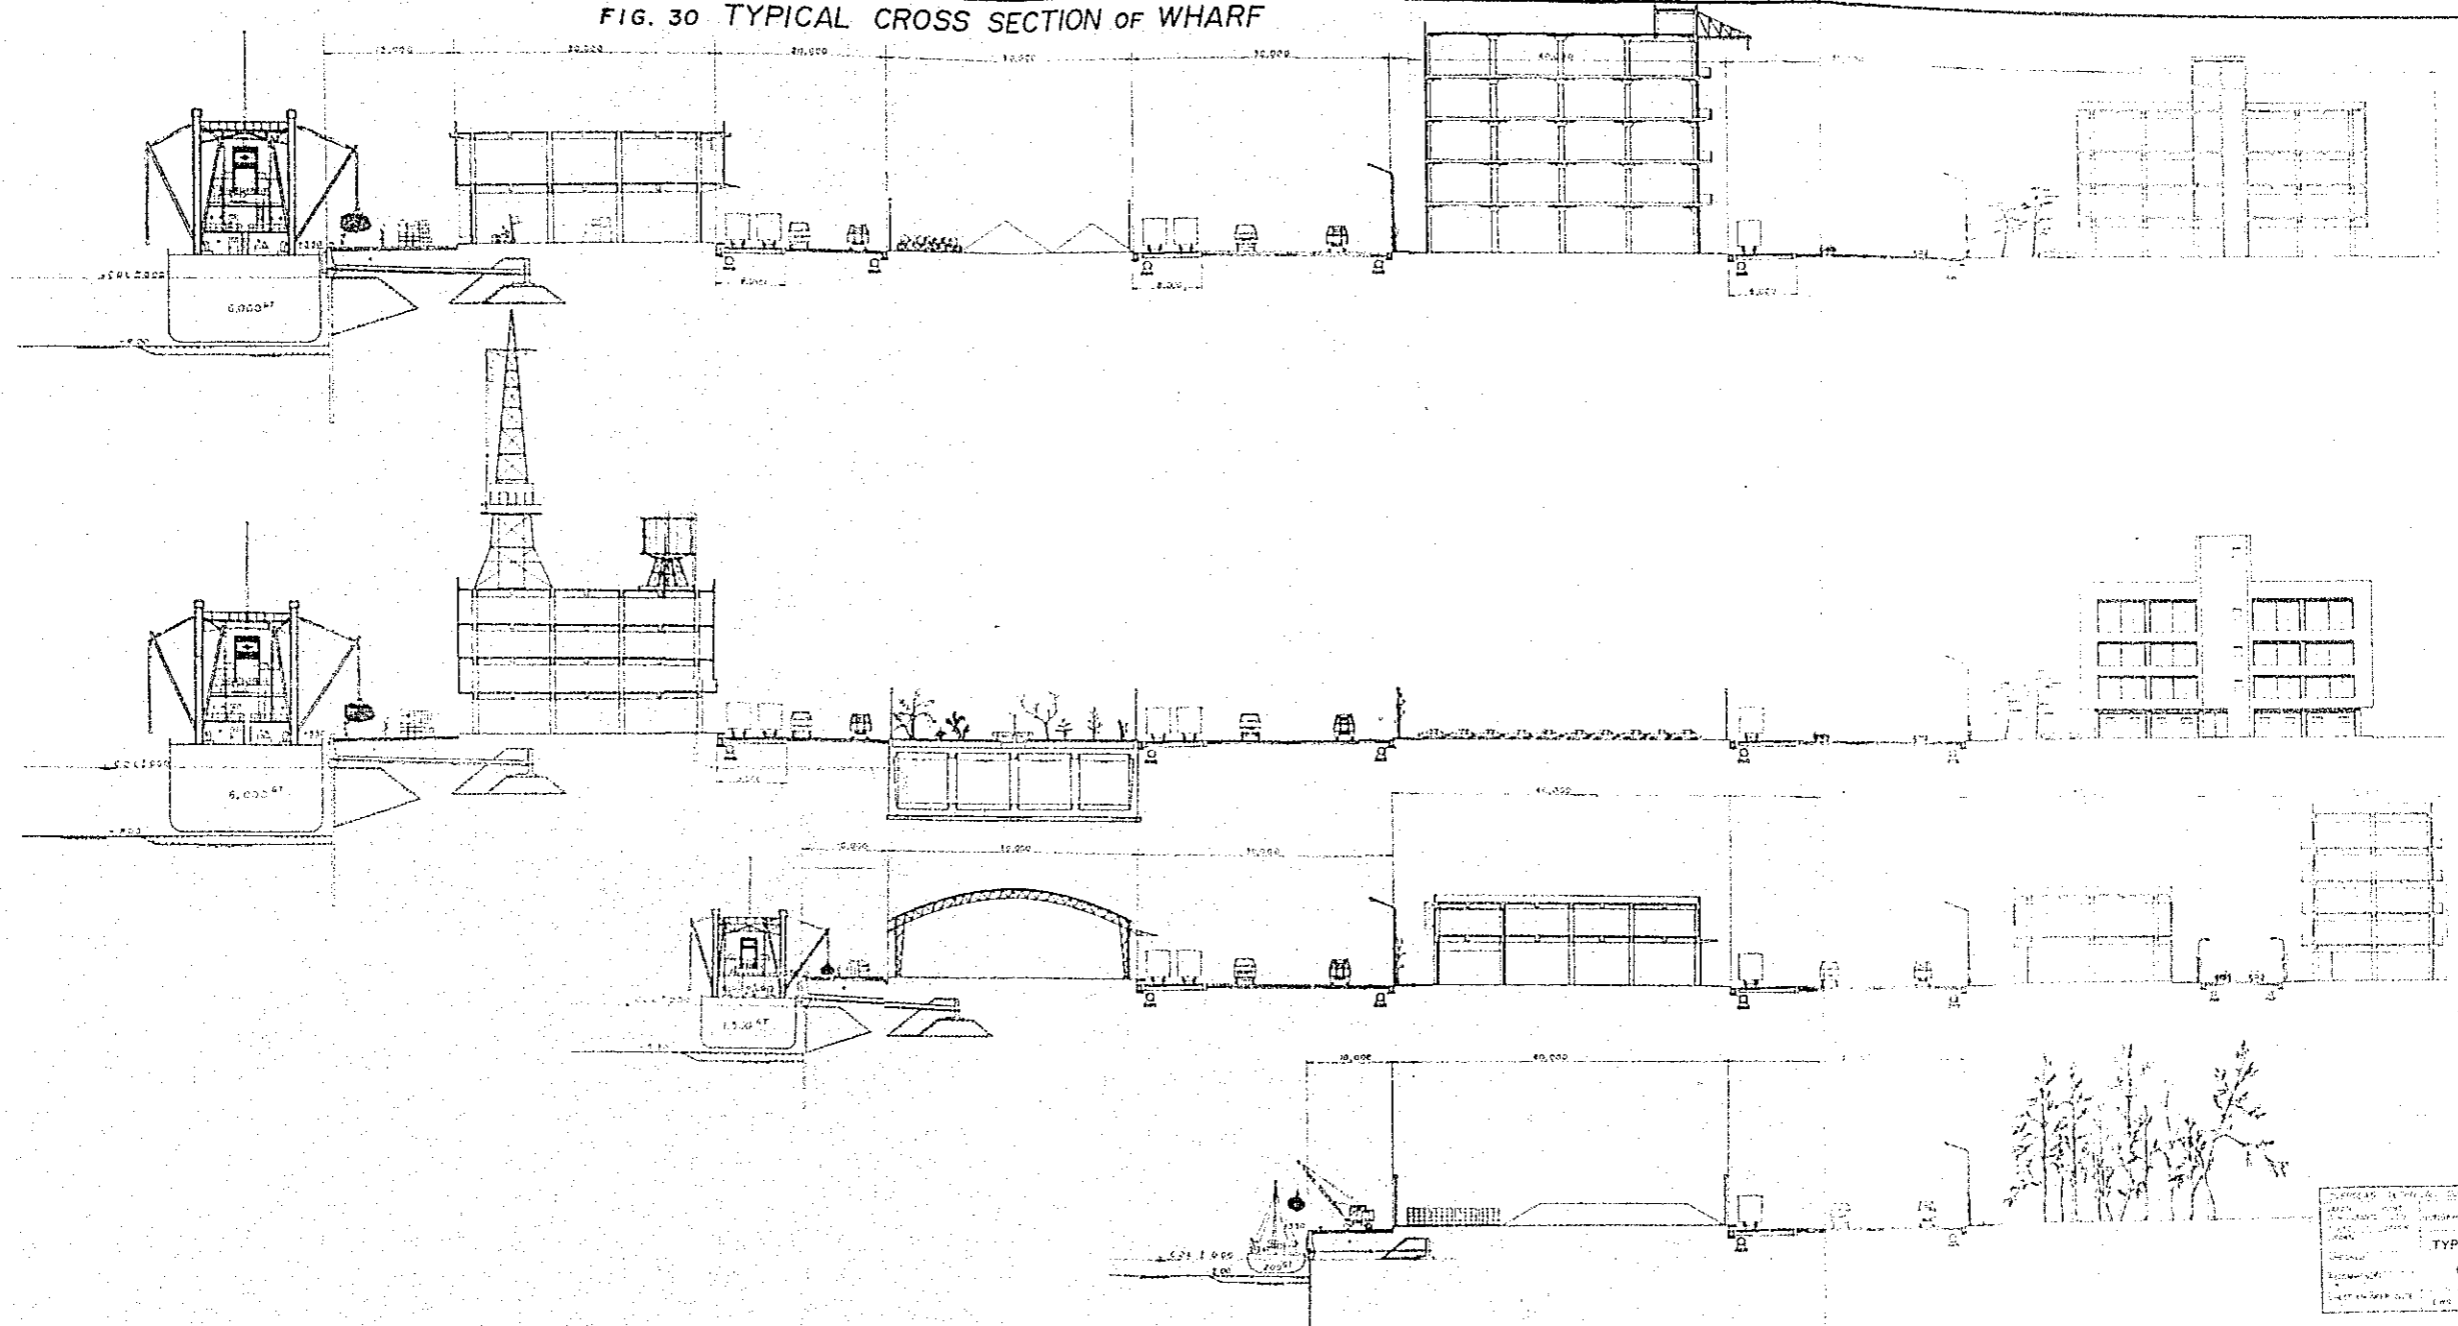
TYPICAL CROSS SECTION OF WHARF
